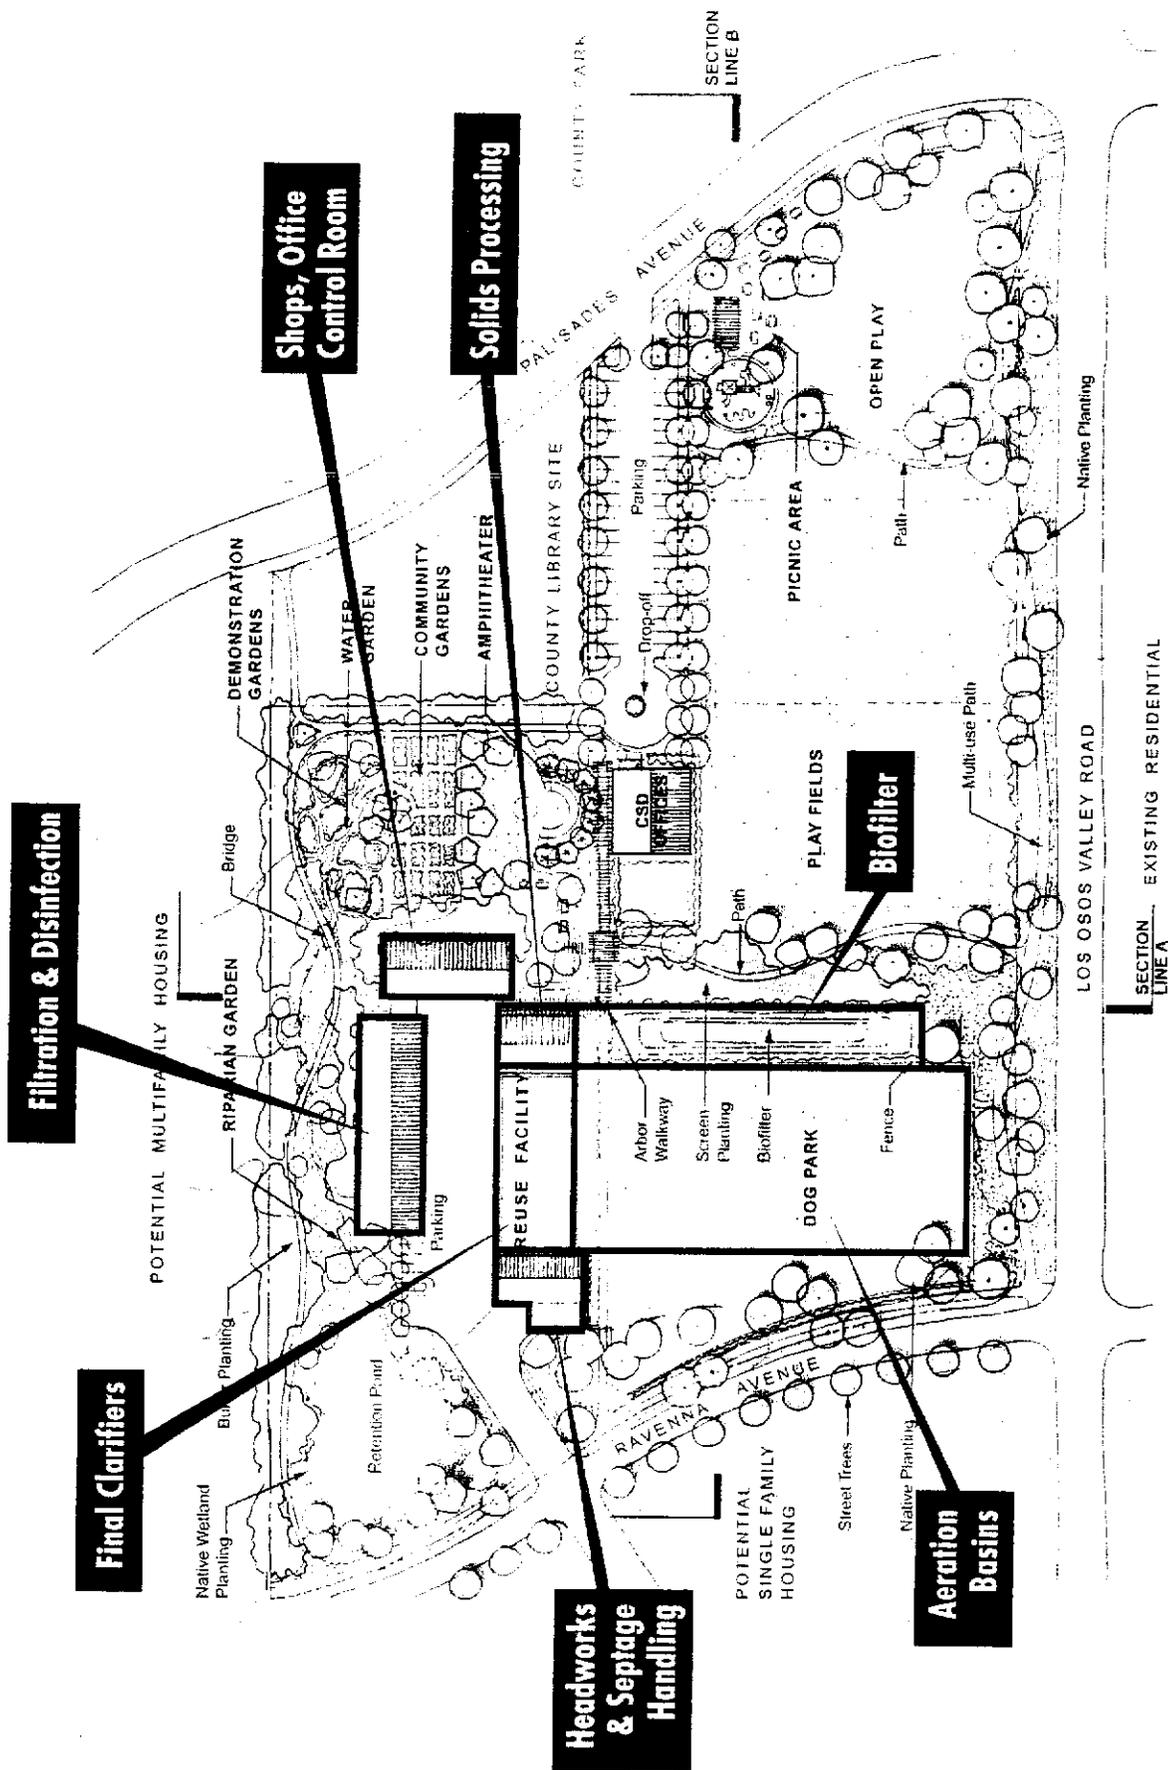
Conceptual Site Plan for Treatment Facility Site
